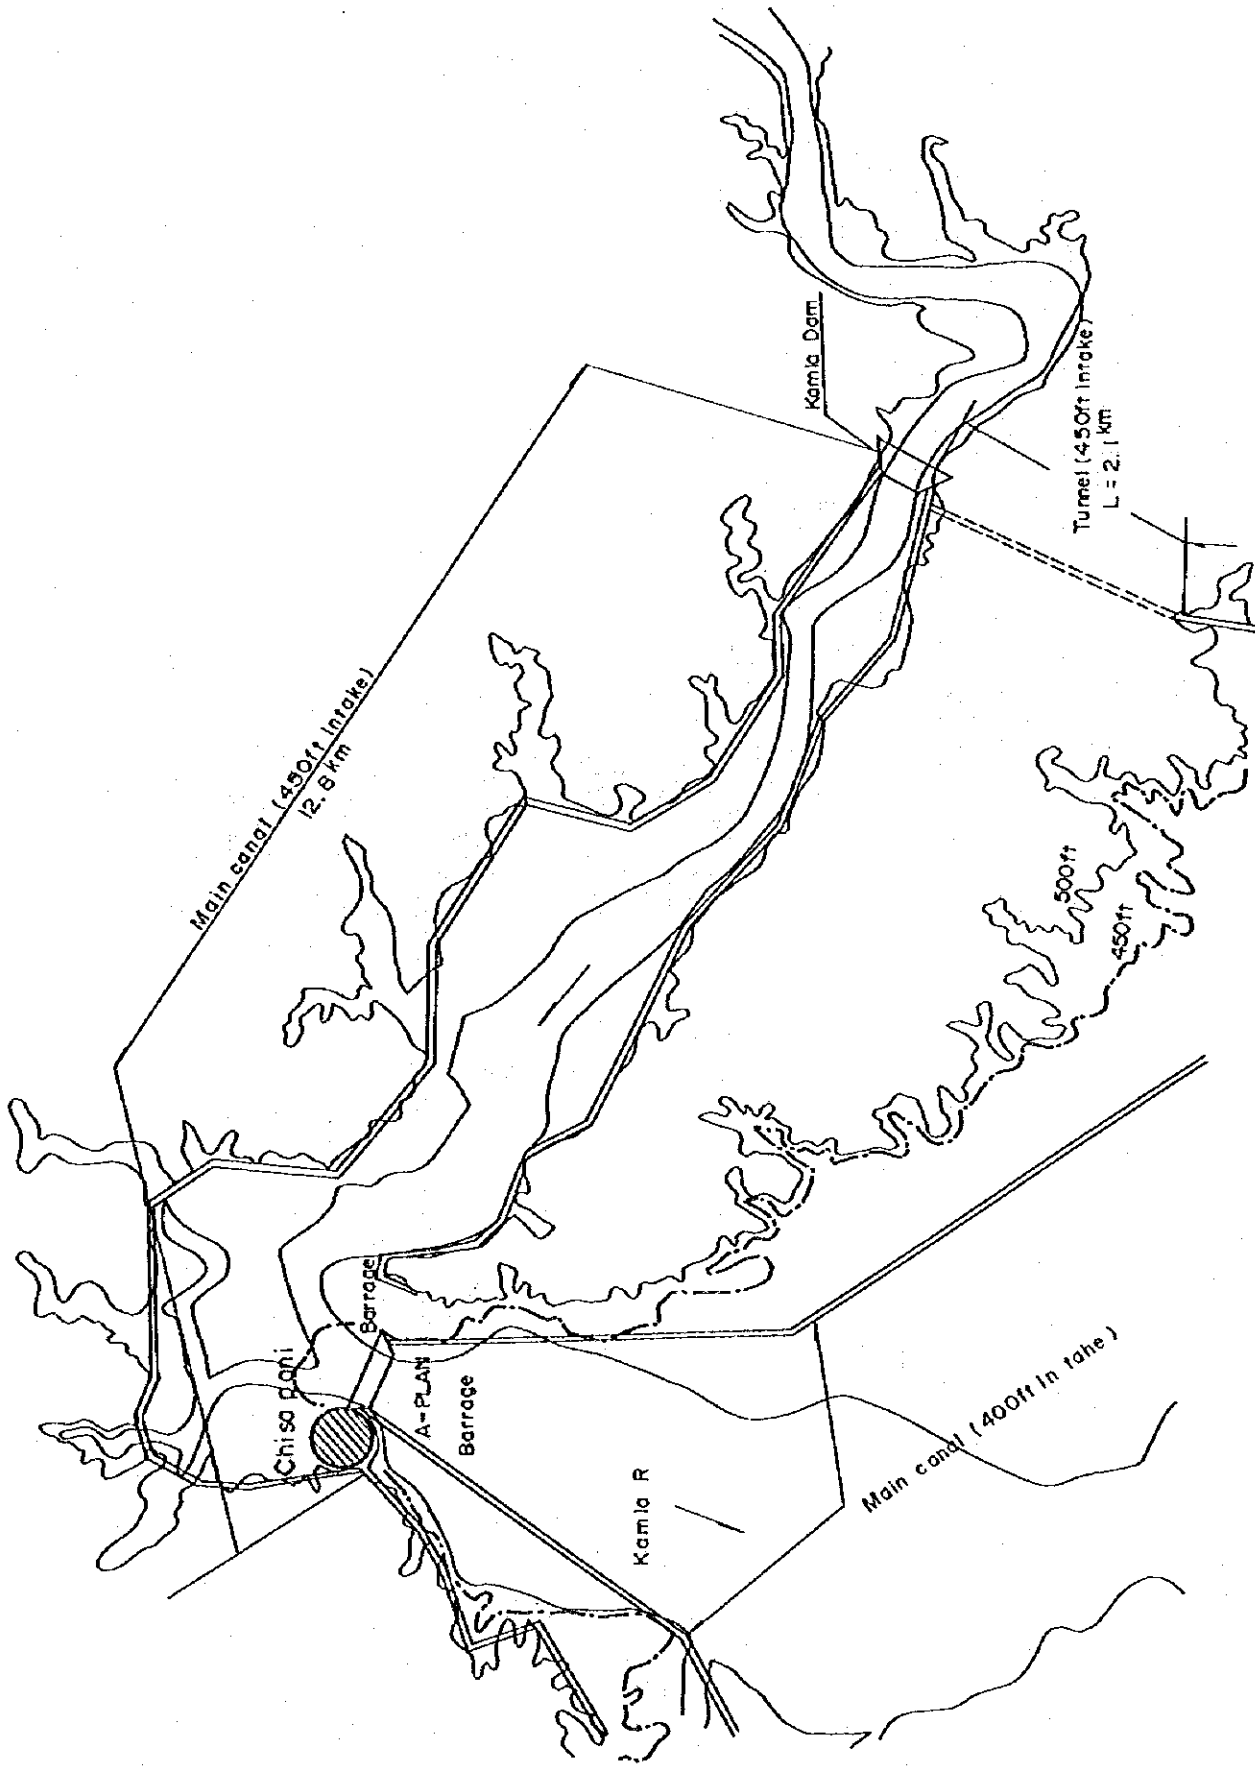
ALTERNATIVE PLAN OF MAIN CANAL INTAKE FOR SUN KOSI MULTIPURPOSE SCHEME
